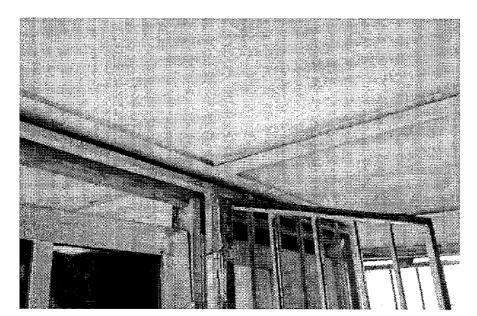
Asbestos cement sheeting located on the ceiling of the corner window display and the entrance to 93 Liverpool Road.
